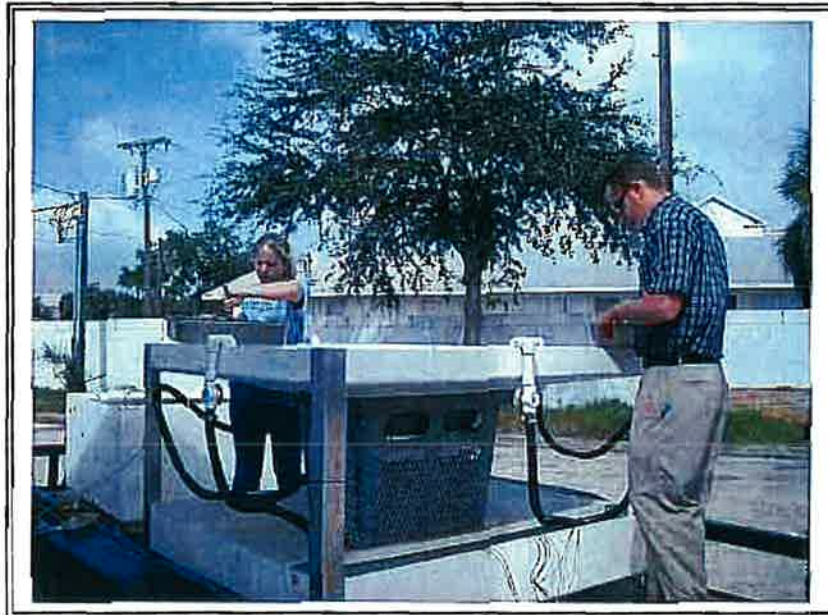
Silica sand being placed into top tier of Skimmer Box testing bed
